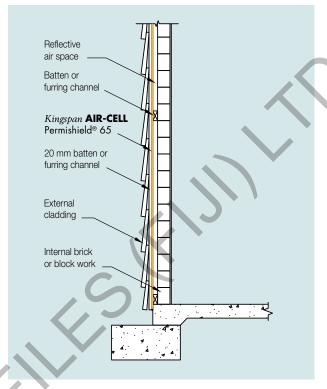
Side elevation of *Kingspan* AIR-CELL Permishield® 65 in a reverse brick veneer wall
